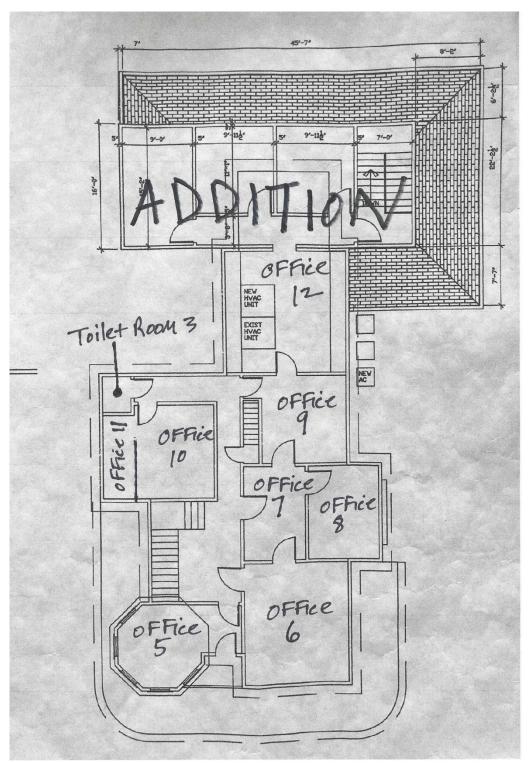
Current (2023) Second Floor Plan for the Franzen House.
